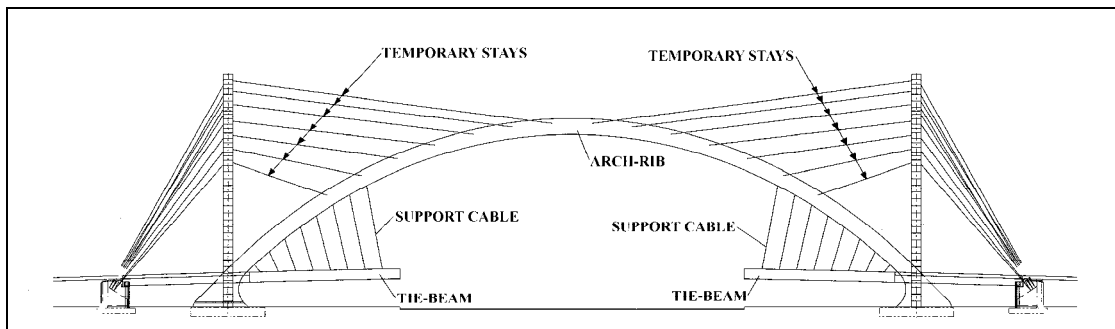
Step 4-Construct Tie-Beam (Modified IRIB Specifications and Construction Plans)
